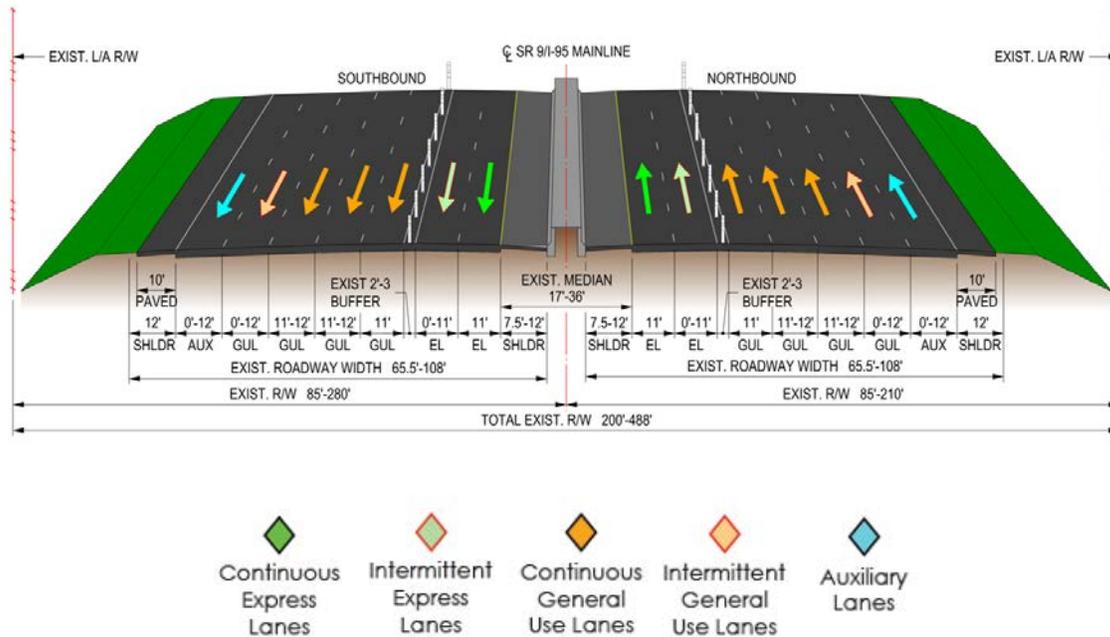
1: Existing Typical Section - SR 9/I-95 Mainline and Express Lanes
